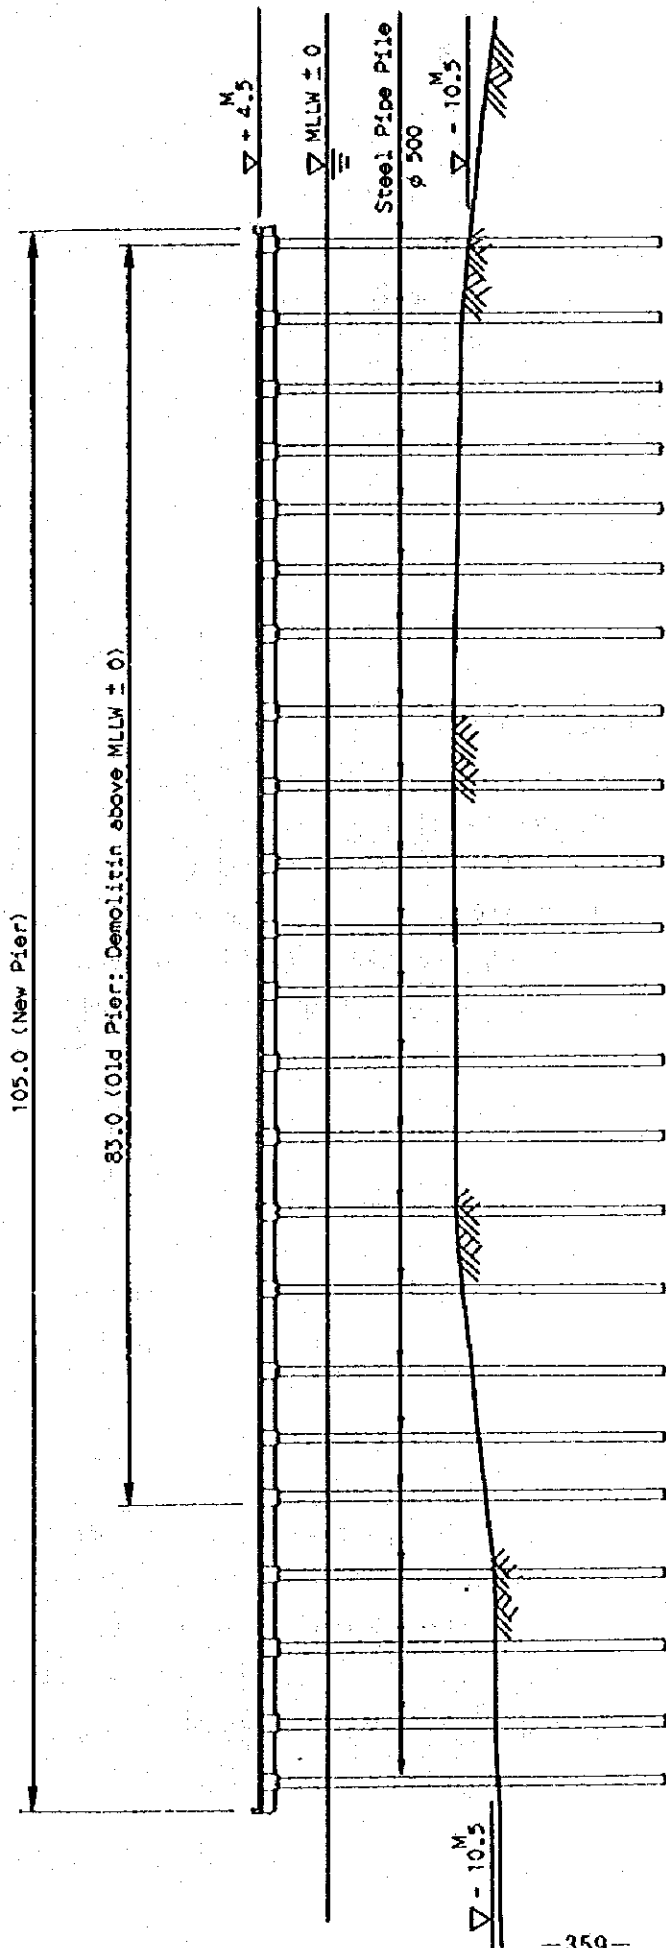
Proposed Section for Pier 13 (Alternative 4)
